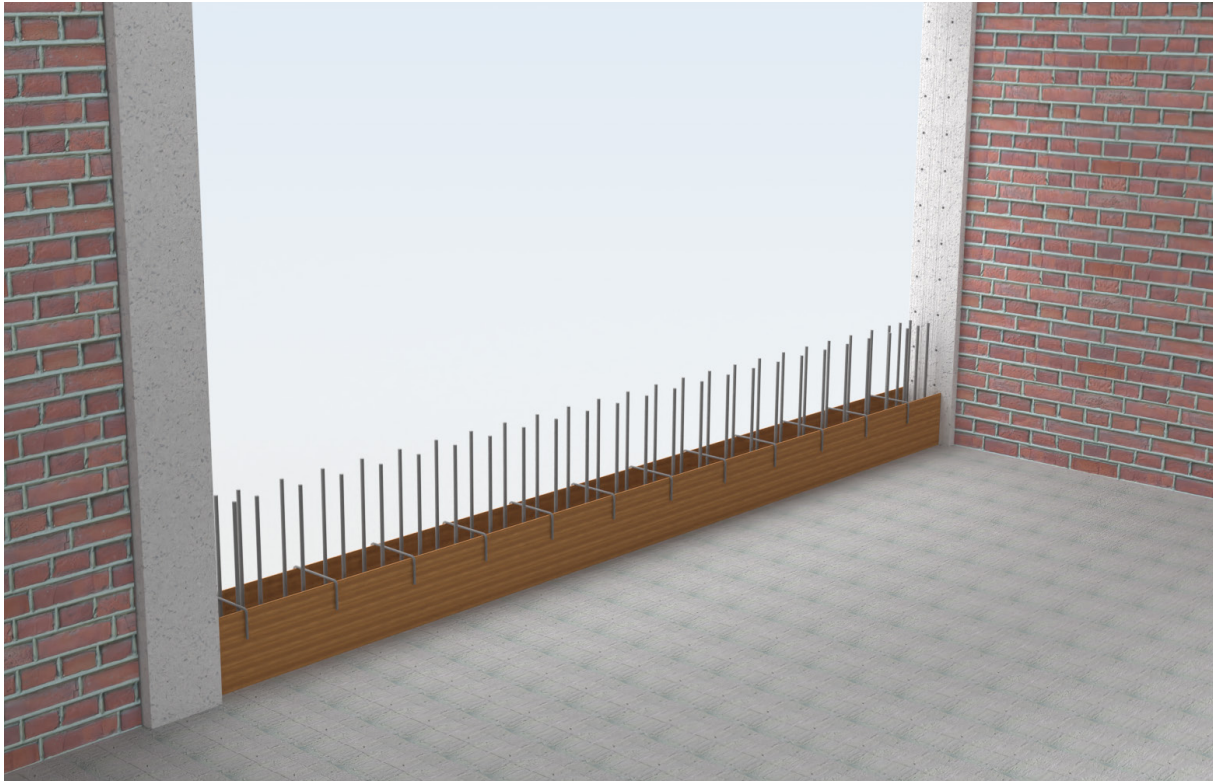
Step 2: Following up, holes are drilled in the existing concrete frame (column & slabs) at certain distances in order to accommodate the longitudinal rebars and the shear dowels.
